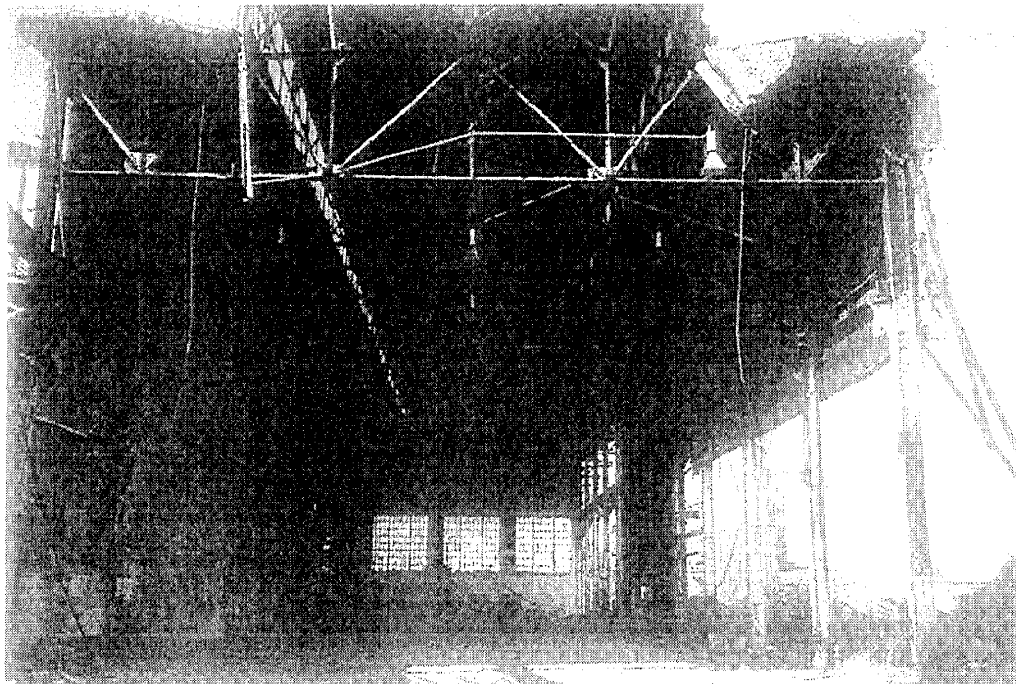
View of the interior of the building shell at the Hazorb Site from the south end, facing north.
